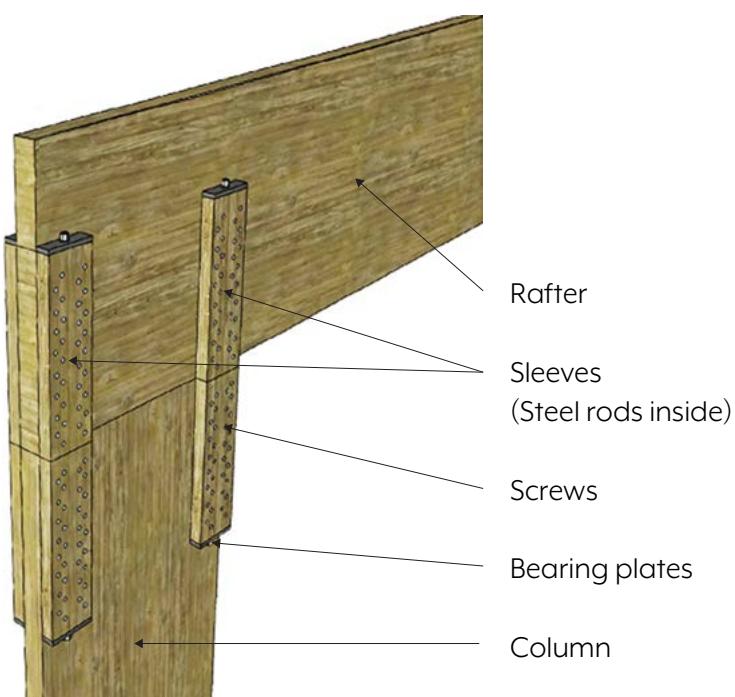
Quick-Connect Moment Connection Knee Joint Application
